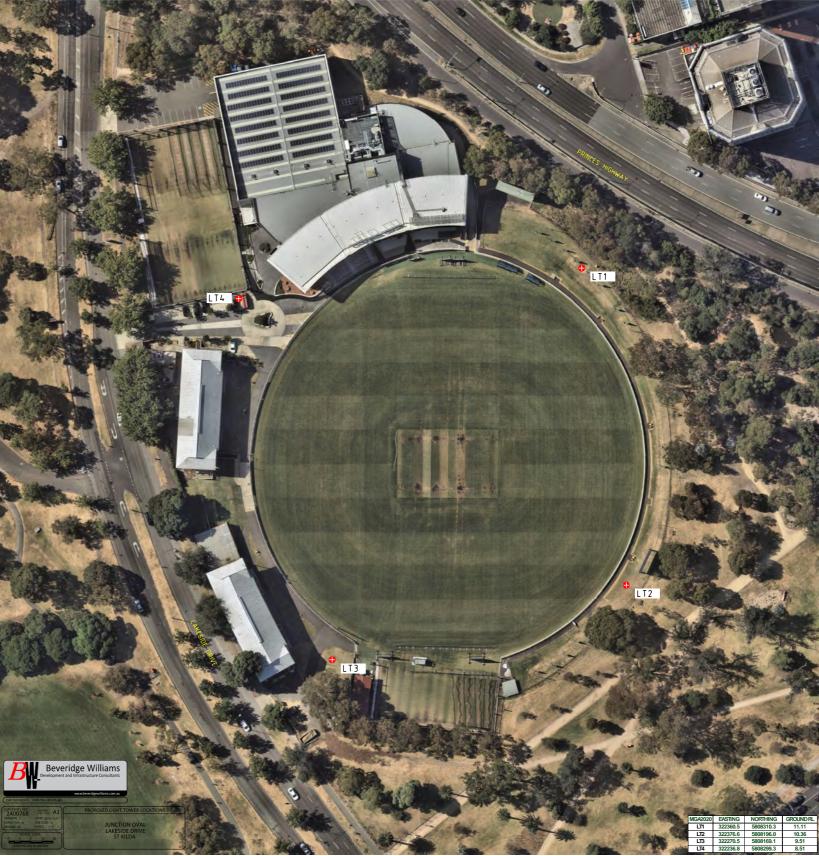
Proposed Light Tower Locations - Surveyor Reference 2400768 -21.06.2024 - Beveridge Williams
